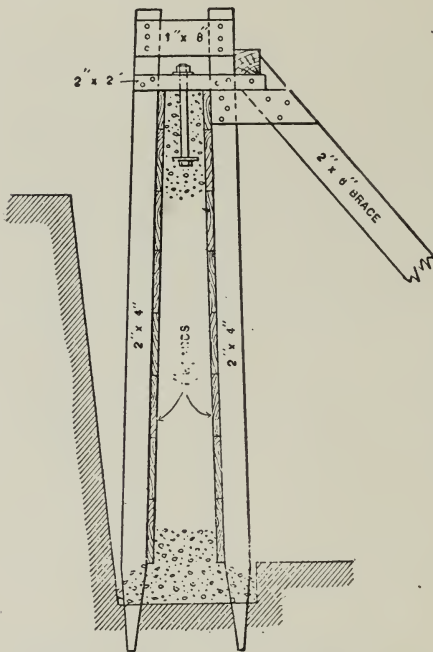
Forms for Concrete Wall Shown in Fig. 481.
